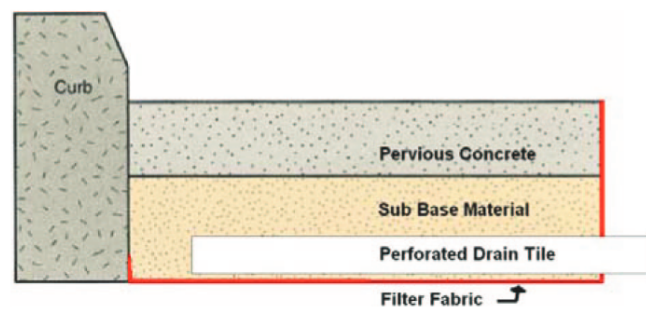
Pervious Concrete with External Drainage Pipe [27]
